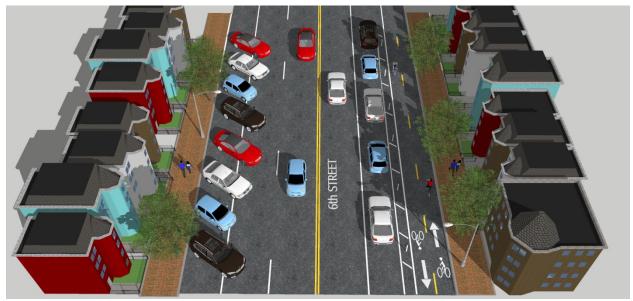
Proposed Diagonal Parking on 6th Street under Alternative 3
